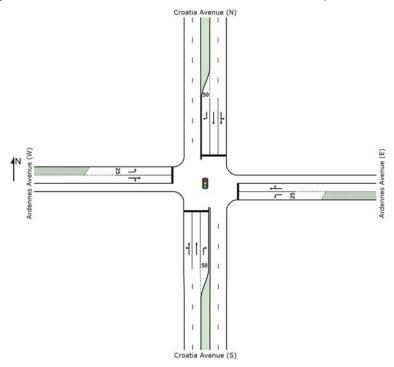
2026 Croatia Avenue/ Ardennes Avenue Layout
